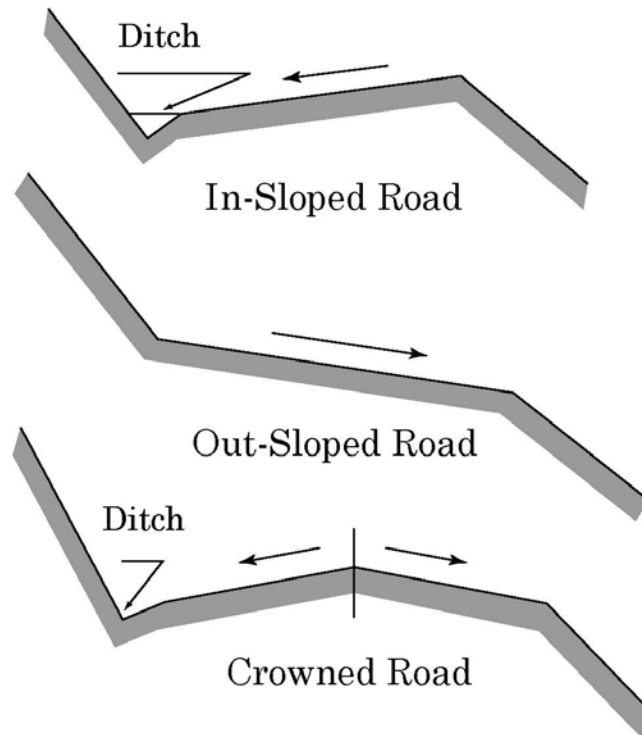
Logging Road Surface Shapes [adapted from Jeffrey Moll, Ronald Copstead & David Kim Johansen, U.S. Forest Service, *Traveled Way Surface Shape* (1997)].
